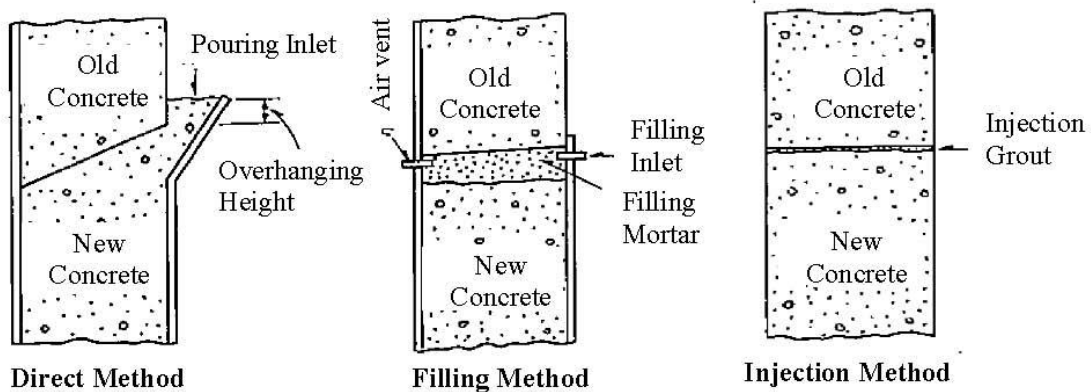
Treatment Method of Construction Joint for Reverse Cast Concrete
